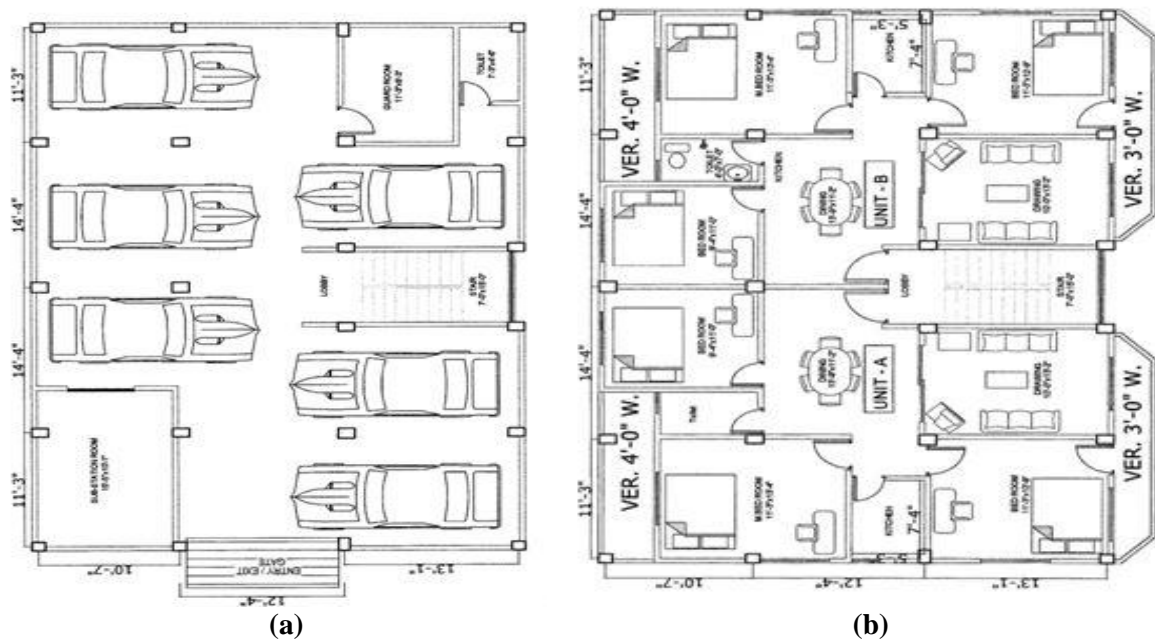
Ground Floor Plan (a), Typical Floor Plan (b)
